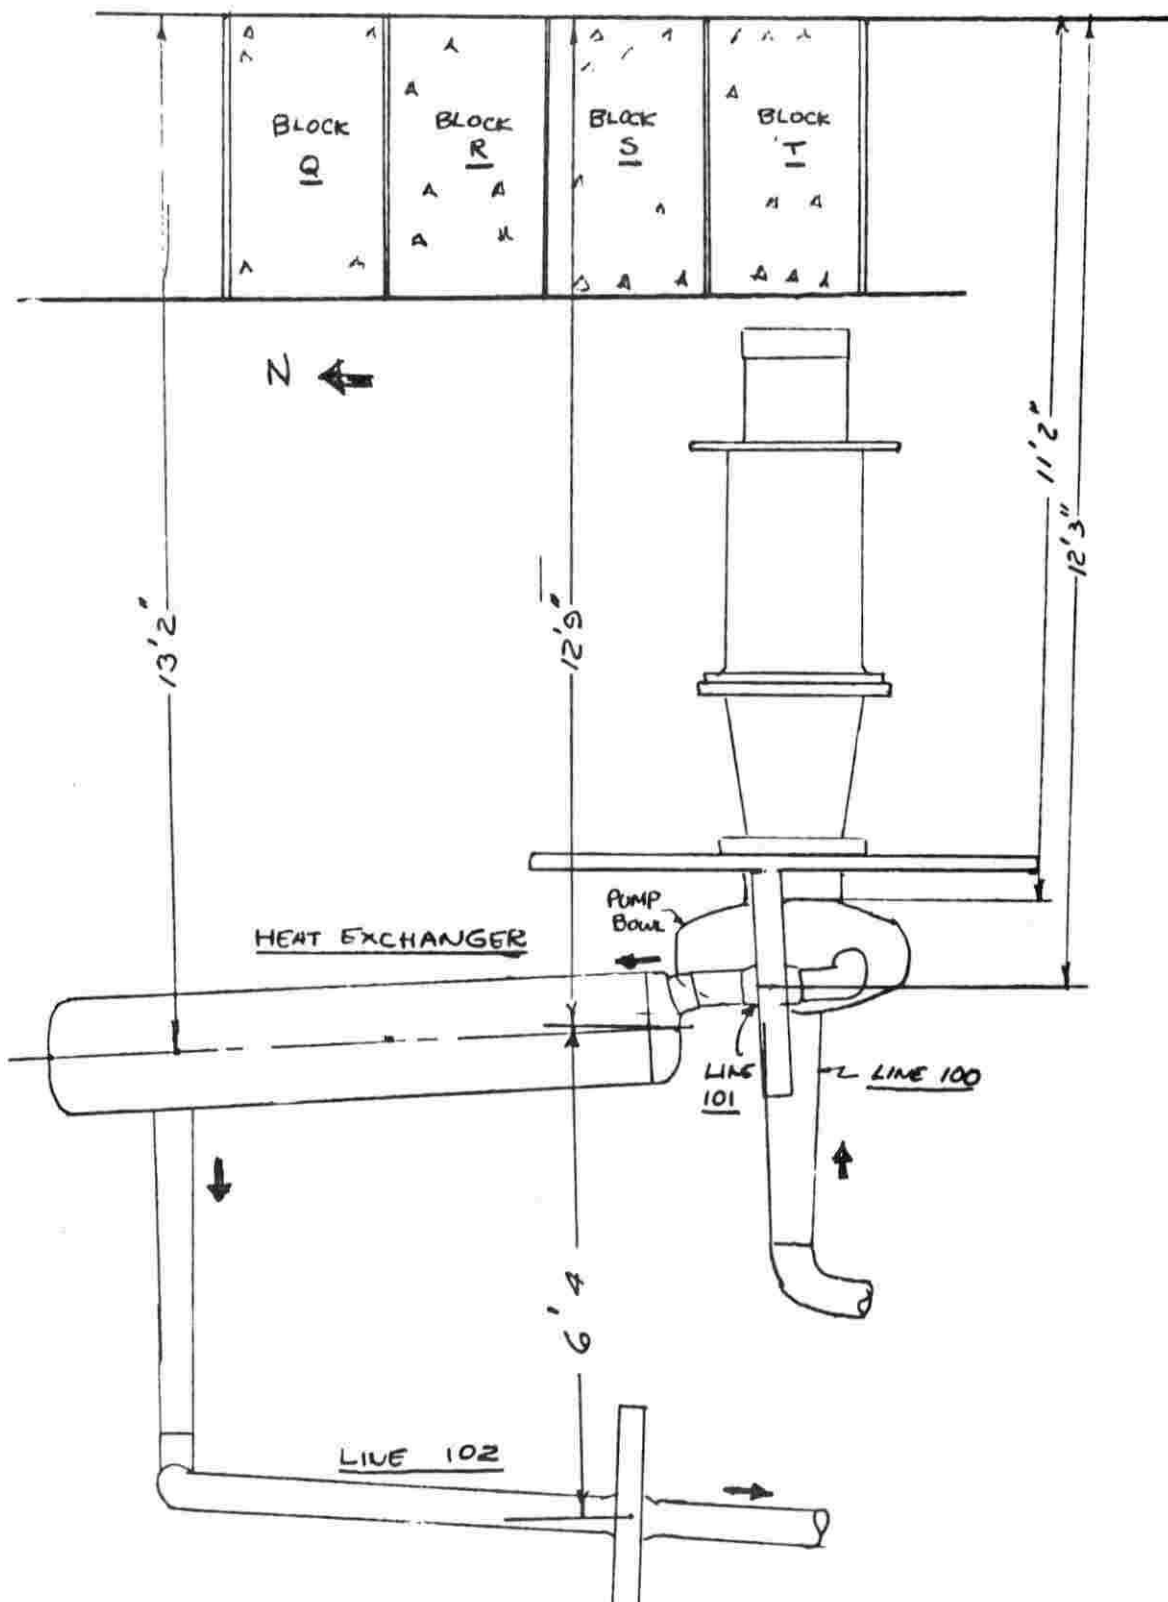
Elevation Sketch of Heat Exchanger Line 102 and Pump.
